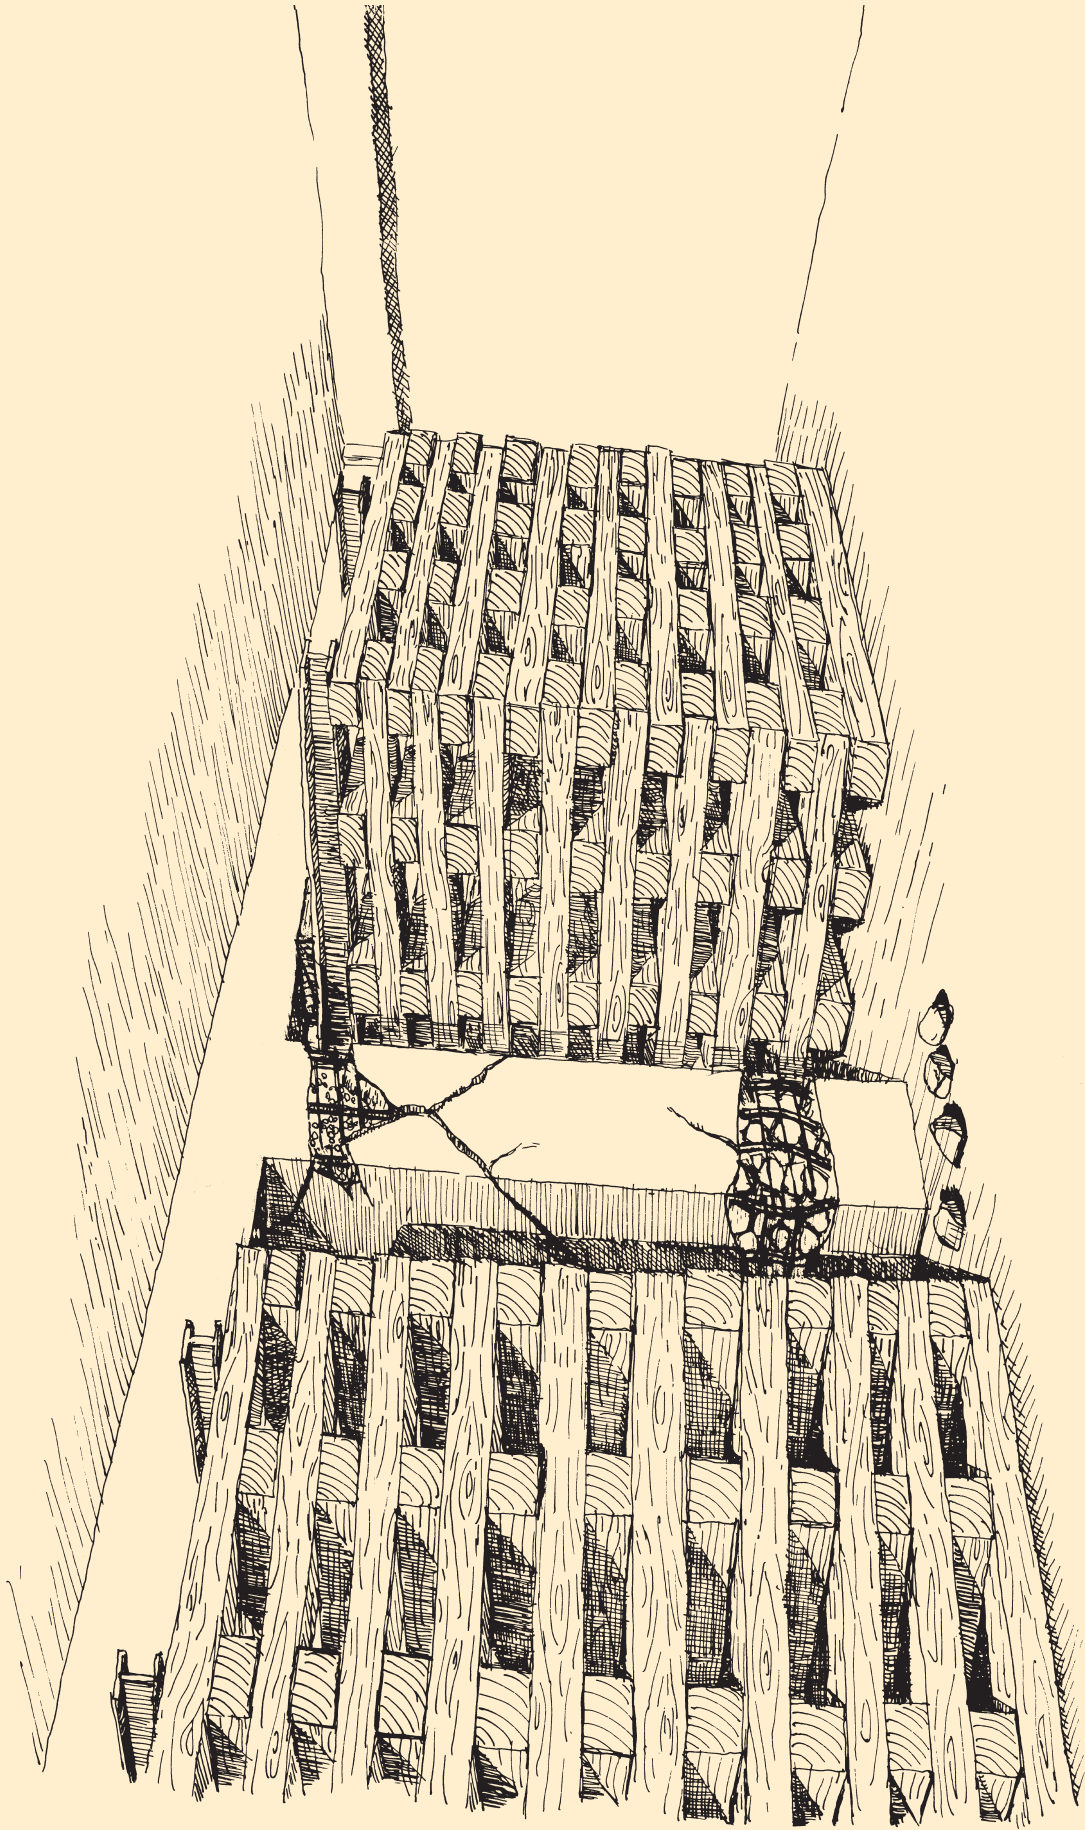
Strong propping using railway timber beams either side of a damaged column.
